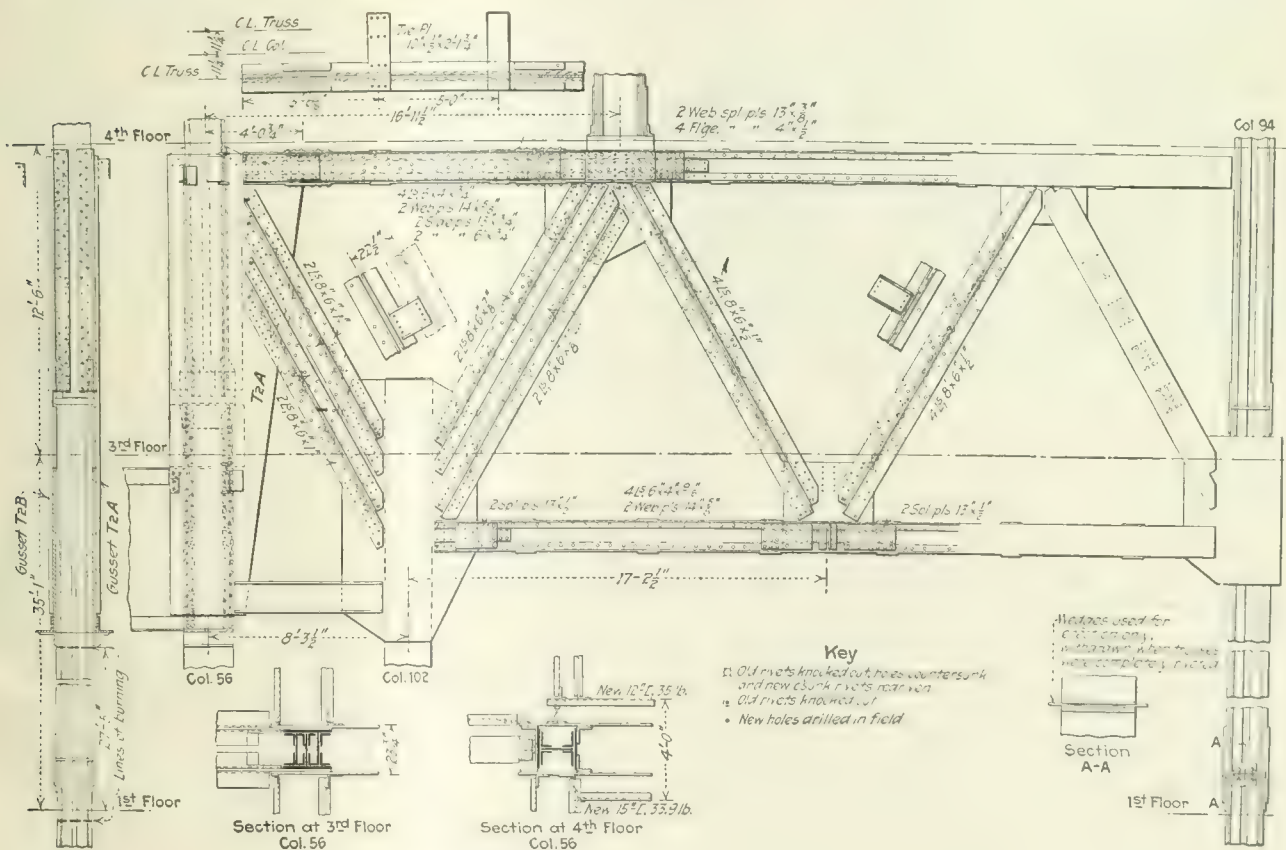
TRUSS CONSTRUCTION AND TYPICAL HEAVY PANEL-POINT DETAIL
